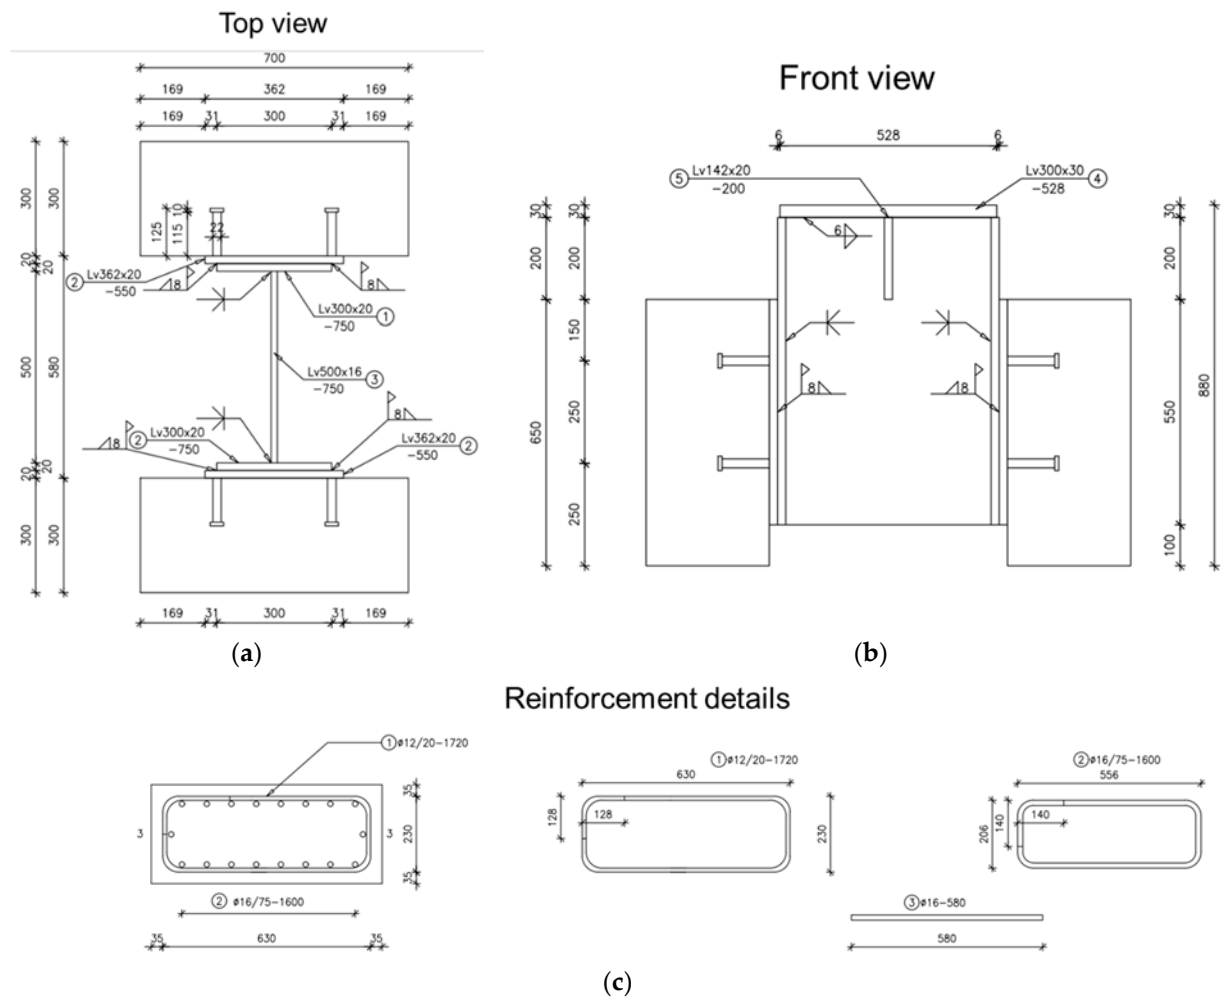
Specimen details: (a) Top view; (b) Front view; (c) Reinforcement details.
